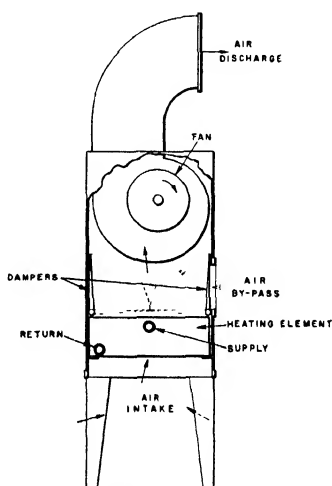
FLOOR MOUNTED UNIT HEATER, HOUSED TYPE FAN
